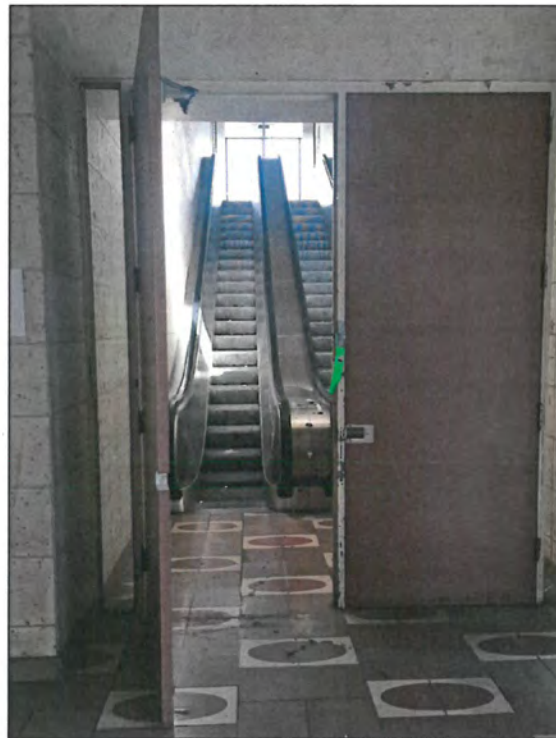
Building 1, interior, escalator from main entrance at south elevation, view north (Snow, 2016)
